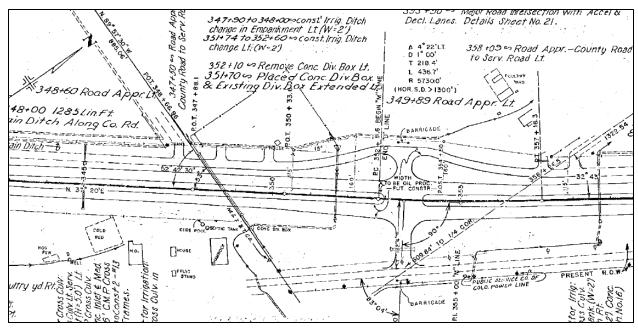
Plan of the intersection of 88th Avenue and US 6 (Colorado State Highway Department, Project No. F.6-1(1), 1949)
